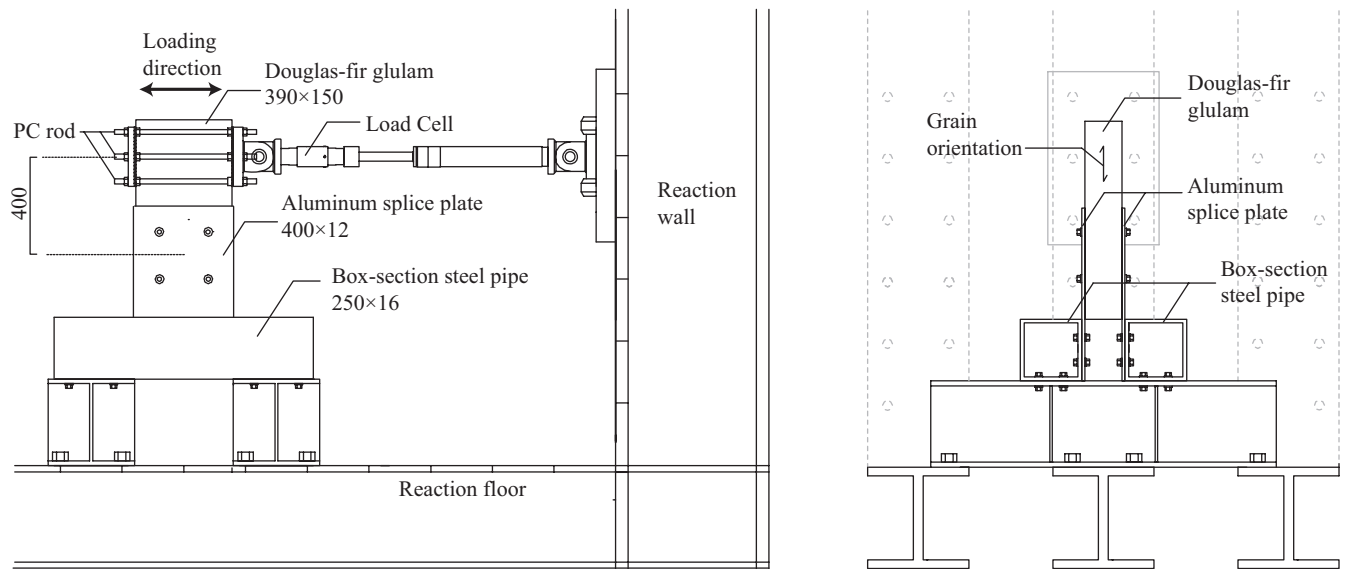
Test setup of specimen A1. Dimensions are in millimeters
